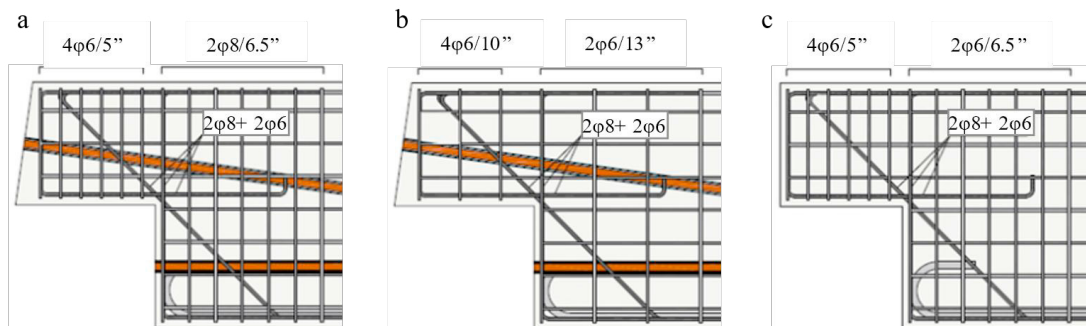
(a) Reinforcement layout A; (b) Reinforcement layout B; (c) Reinforcement layout C.
